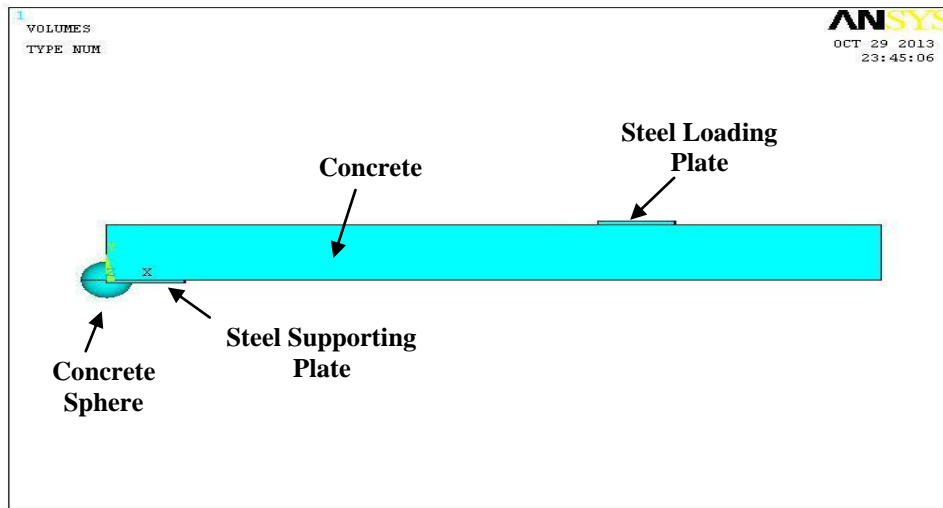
Modeling of Concrete Bubbled Slab, Steel Supporting Plate and Steel loading Plate
